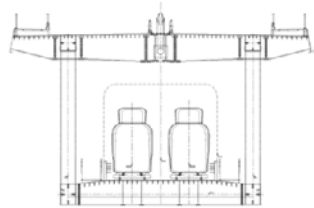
Cross section of standard section of girder in the Twin River Bridge
